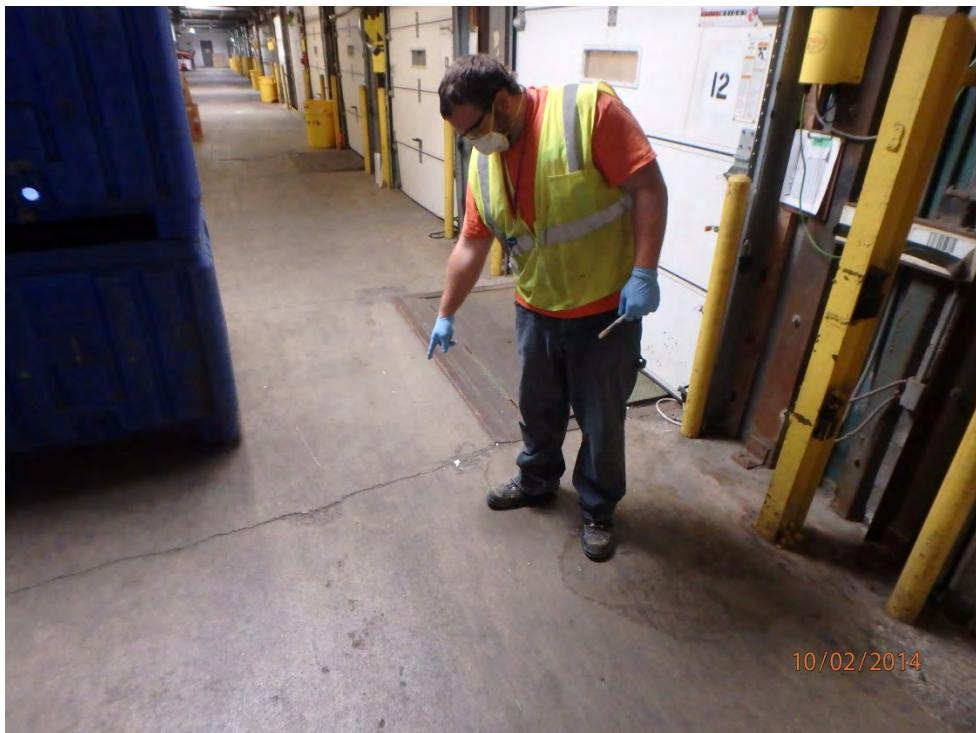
Sample 079 dust from east-west control joint near Column F4
